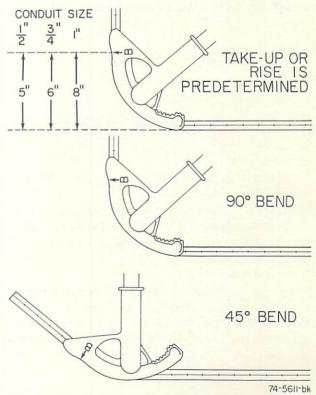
Bender Take-Up or Rise — Standard Code Bends.
